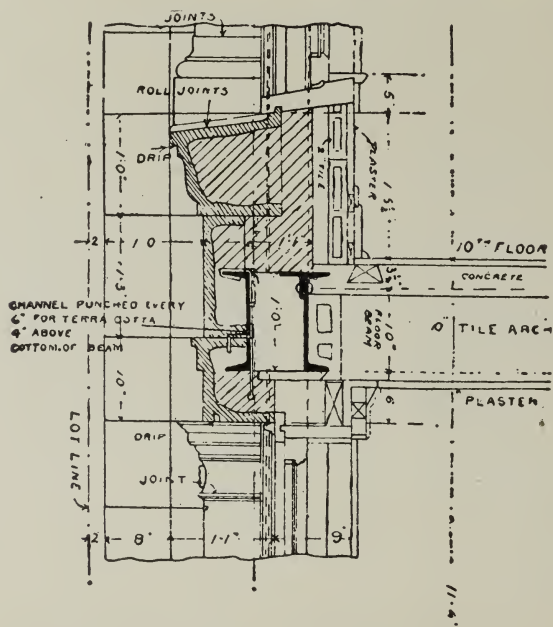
Spandrel Wall Supports. New York Life Building, Chicago.
